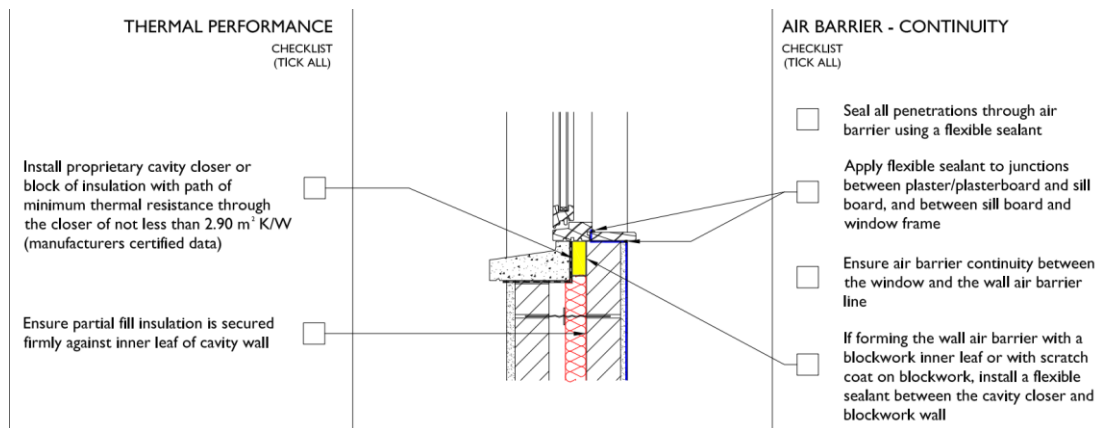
Cavity Wall Sill Detail with concrete sill forward of insulation (TGD Part L ACDs)
